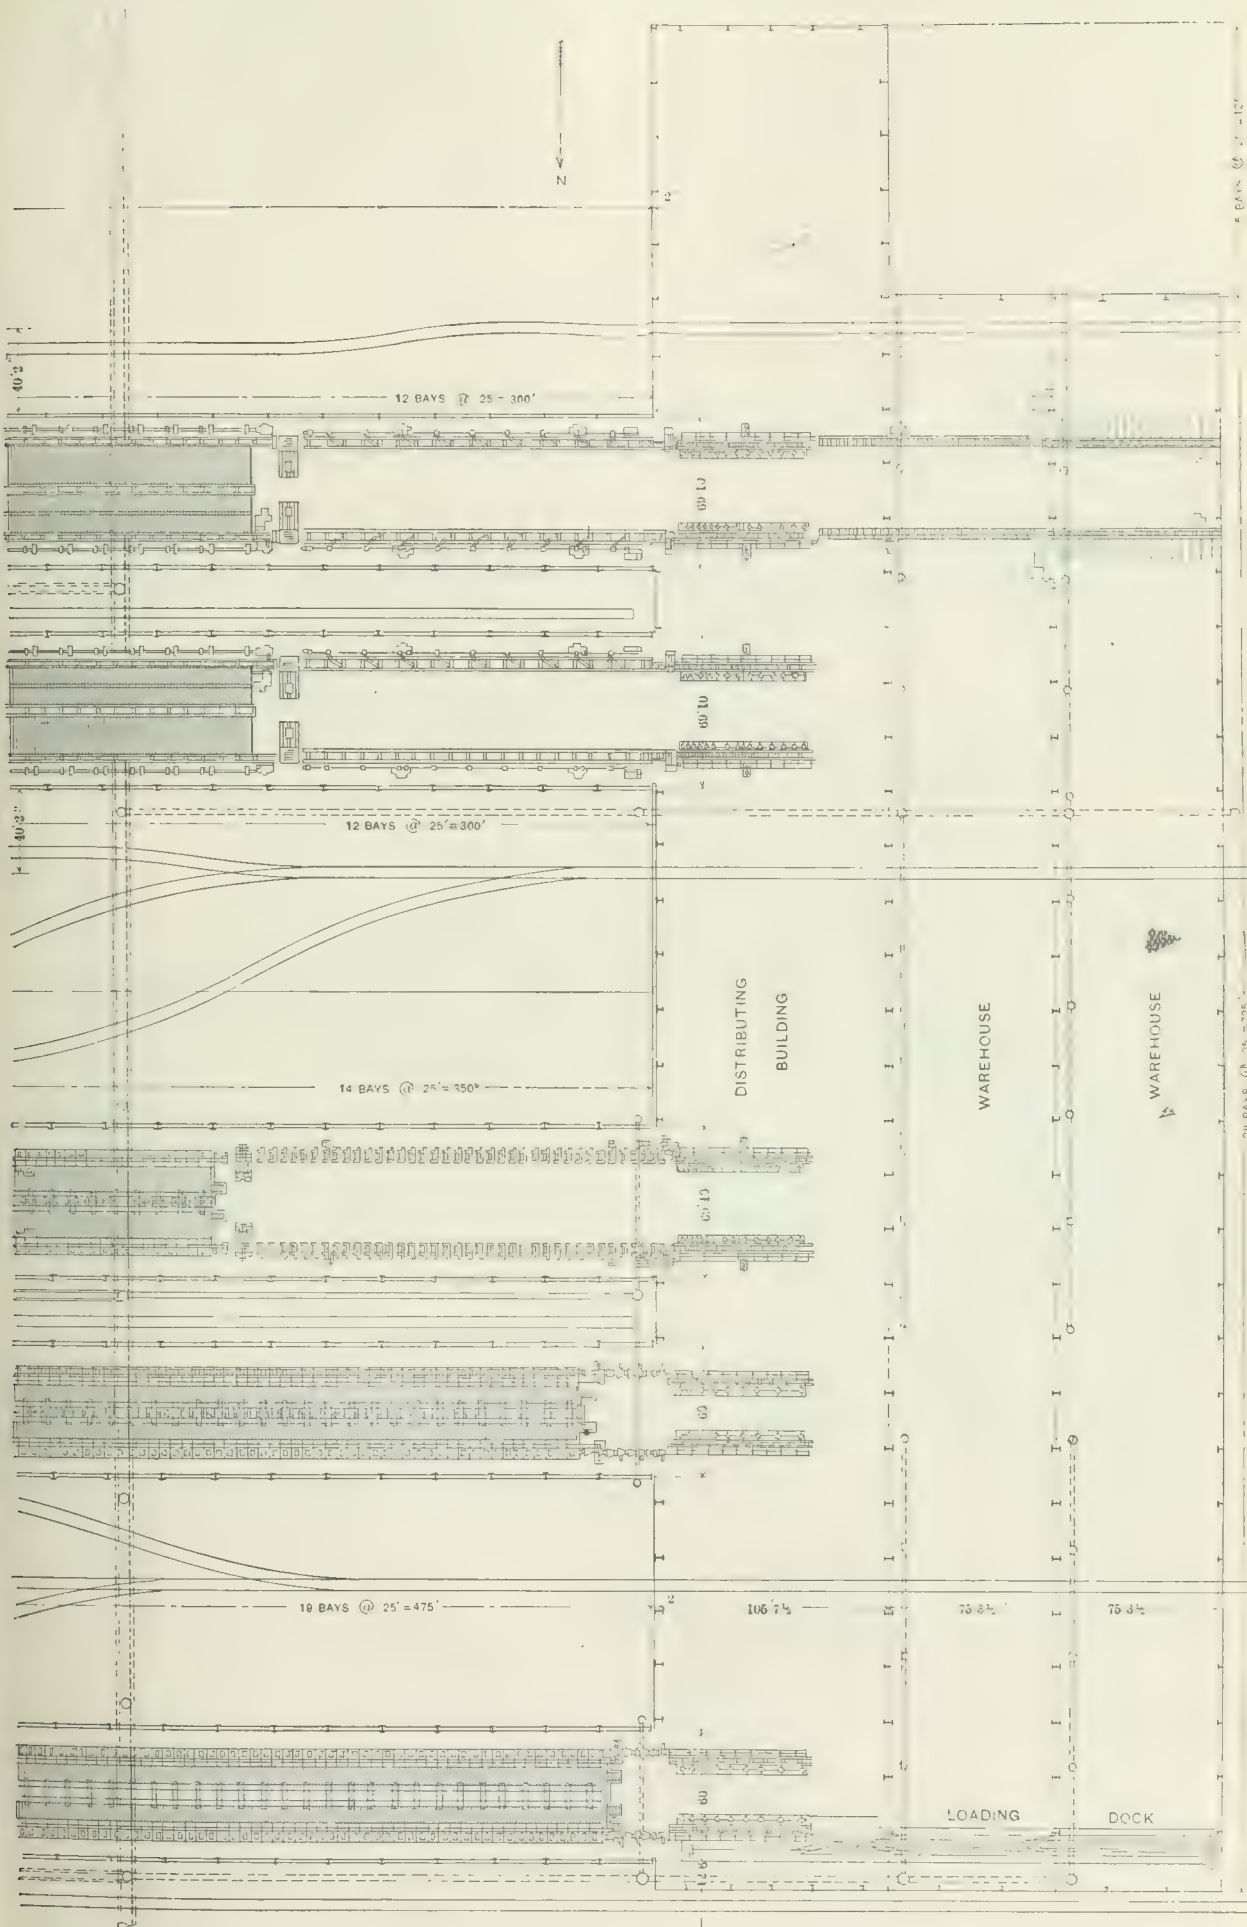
GENERAL PLAN OF THE FIVE NEW MERCHANT
